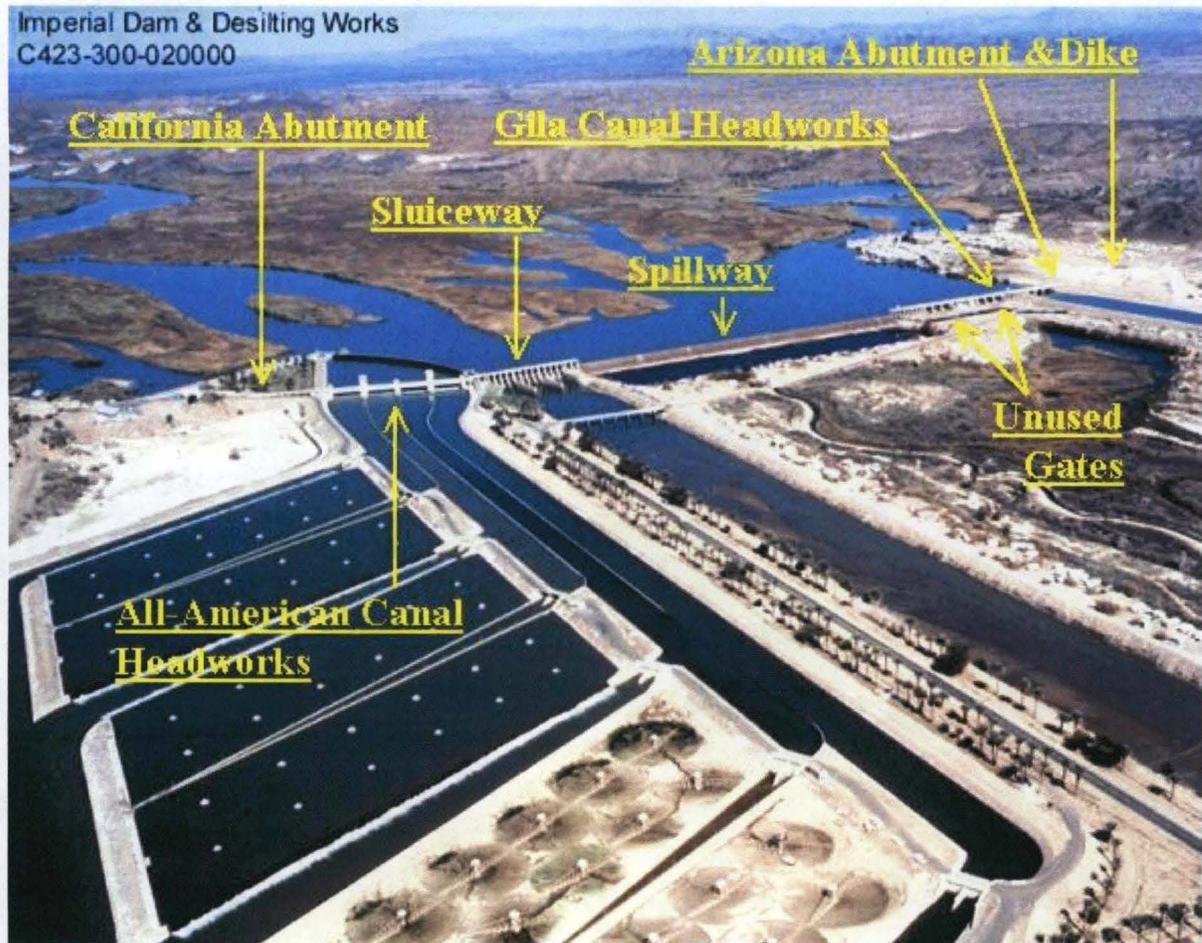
Imperial Diversion Dam and Appurtenances. In part, this study investigates the hydraulic conditions of the spillway and stilling basin.
